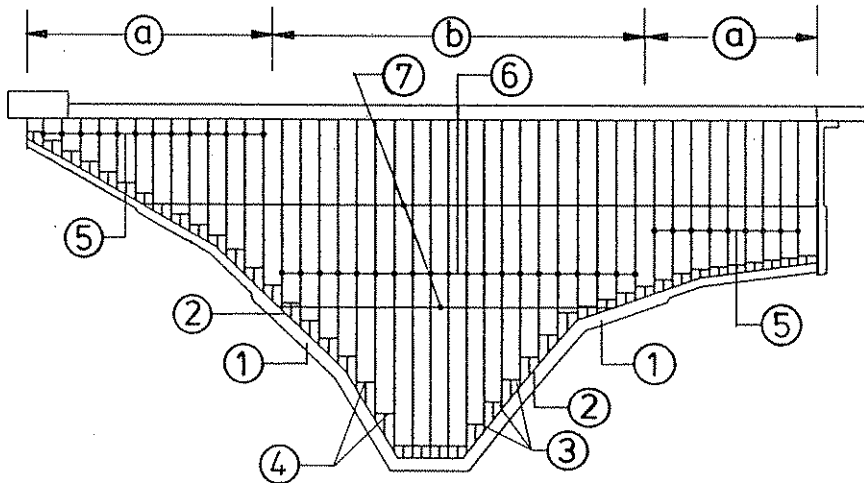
Concrete face sealing. Joint layout (example Bakun 1996, courtesy of LI).
